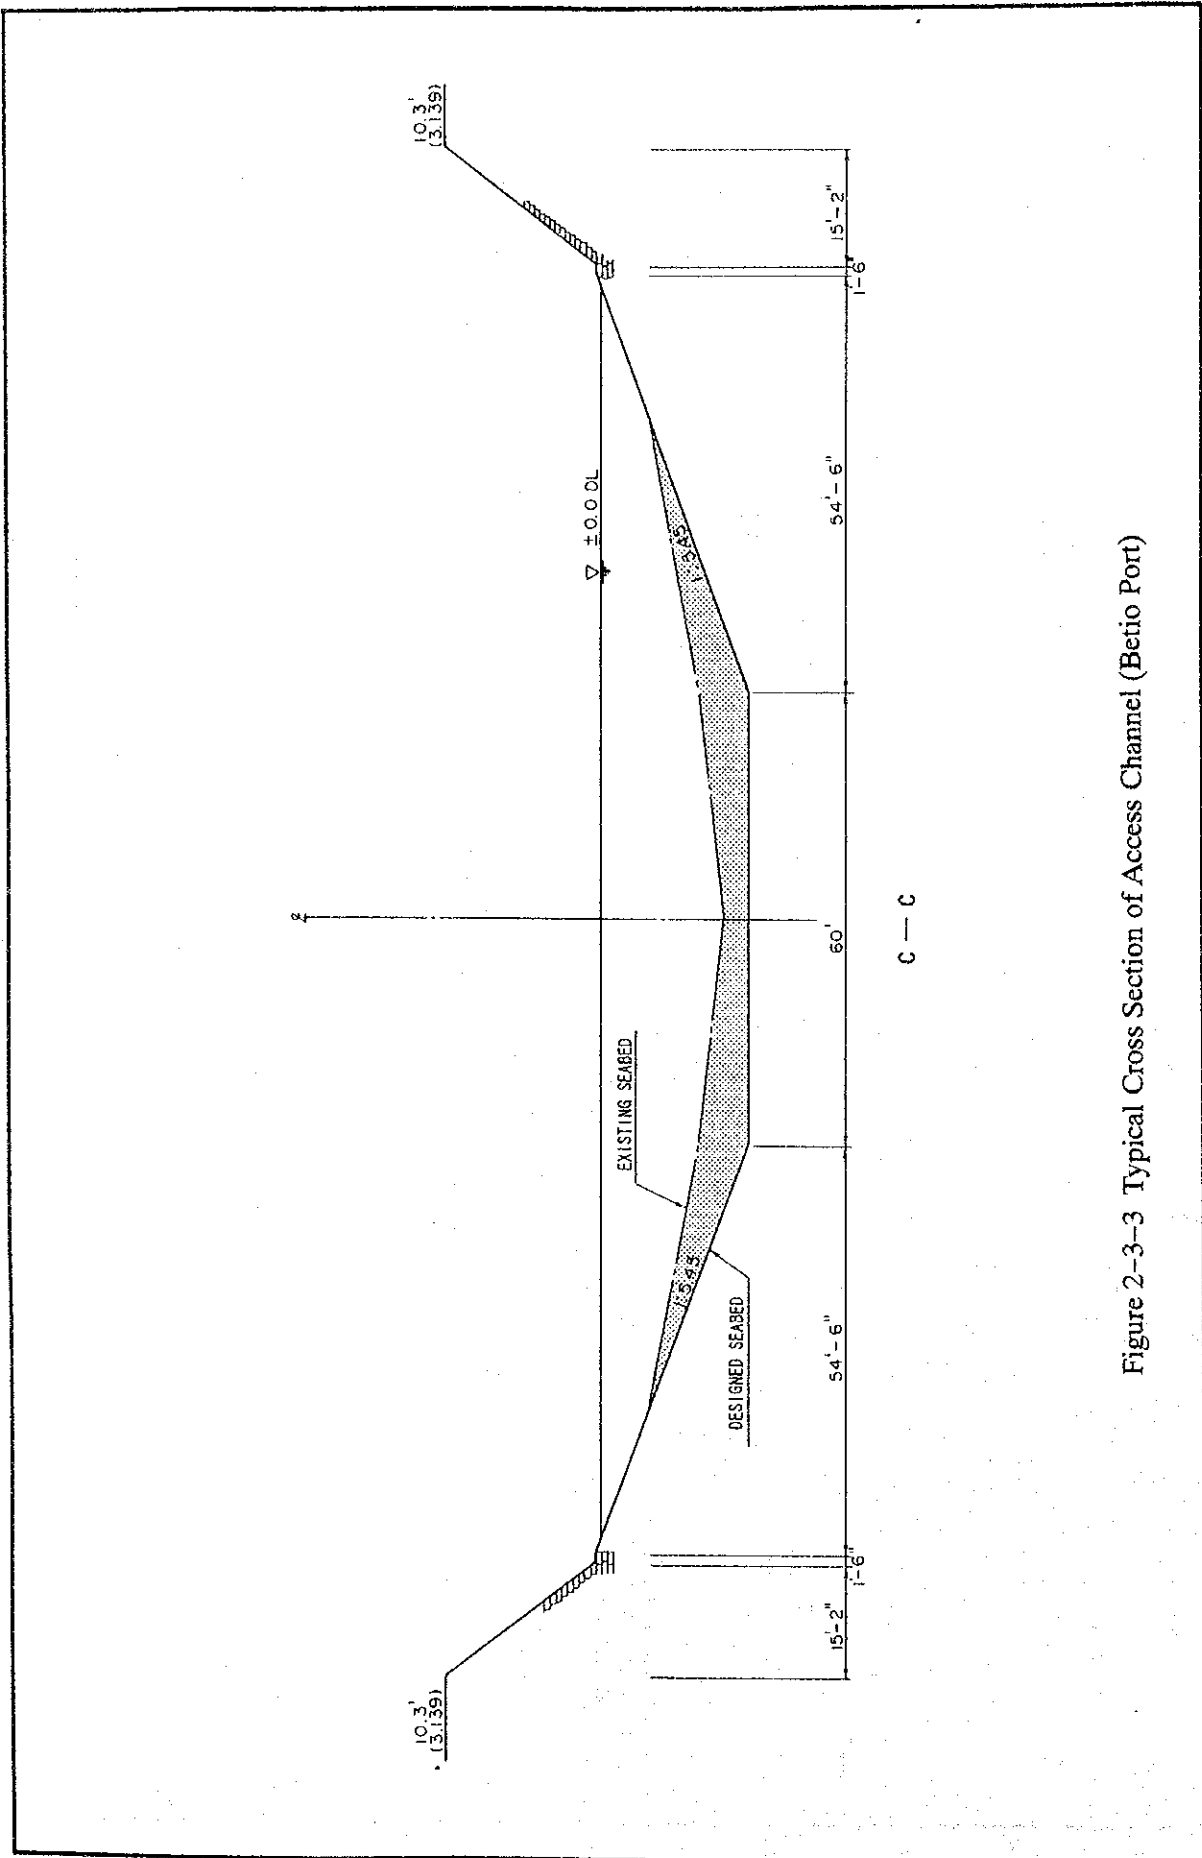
Typical Cross Section of Access Channel (Betio Port)
